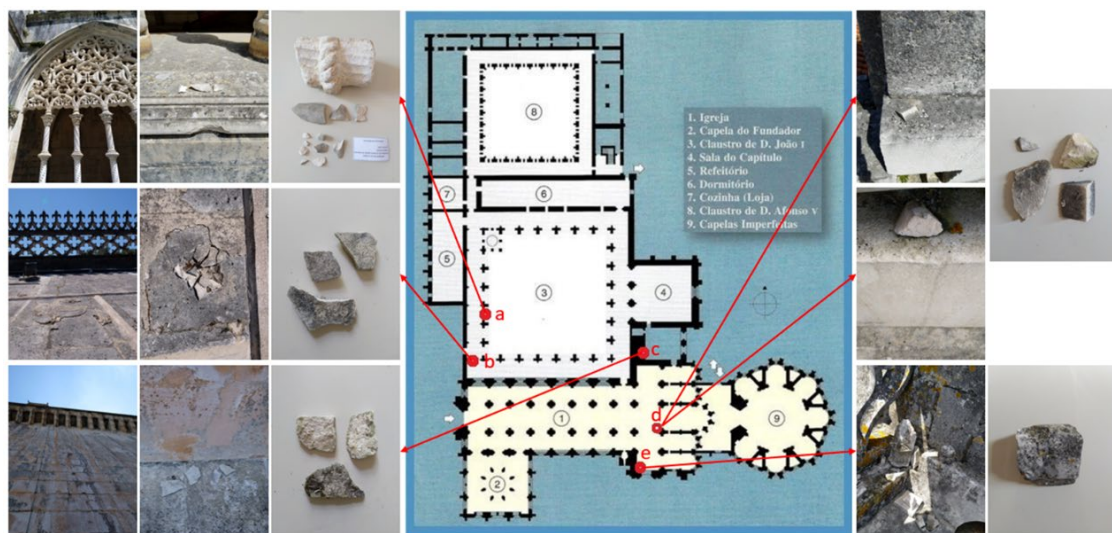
Locations of samples collected from Batalha Monastery: a. west gallery of the Royal Cloister, outside the 3rd window (ground-floor level); b. Royal cloister roof top (roof level); c. Church north-aisle eaves arch (roof level); d. Church roof railing (roof level); e. Church south carved baluster (roof level).
